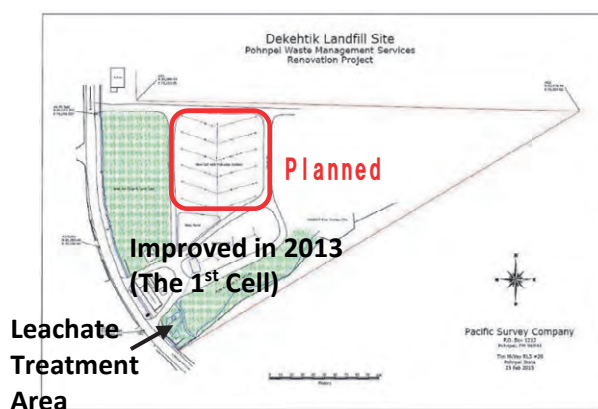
The Improvement plan of the site (Drafted by PWMS)
